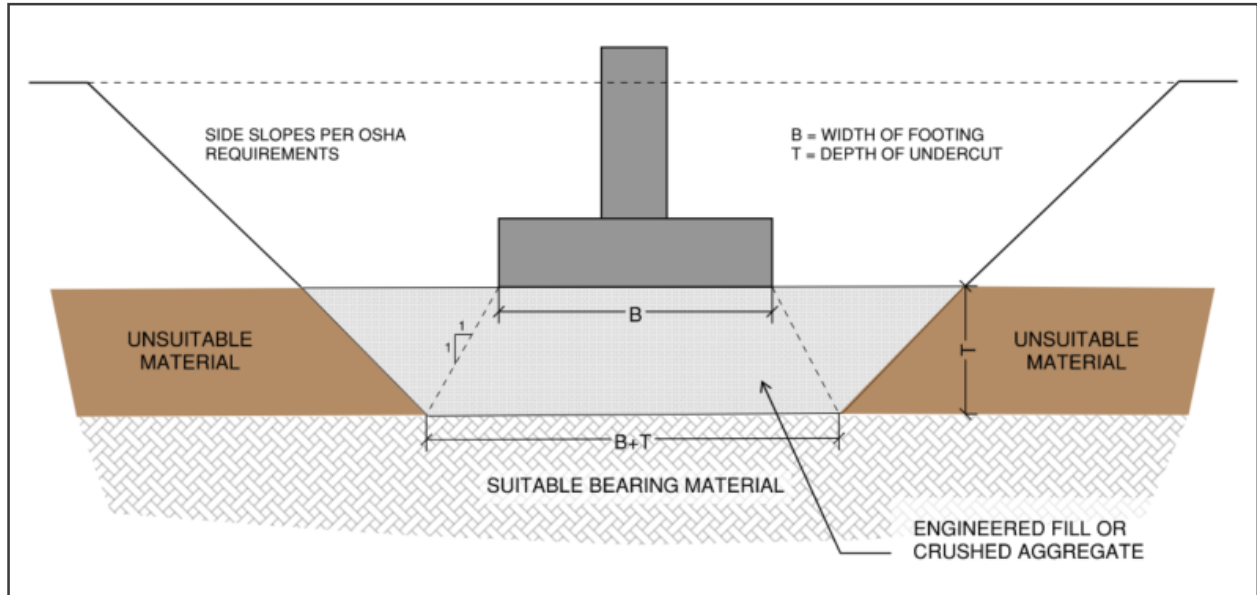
Typical Foundation Undercutting Diagram
